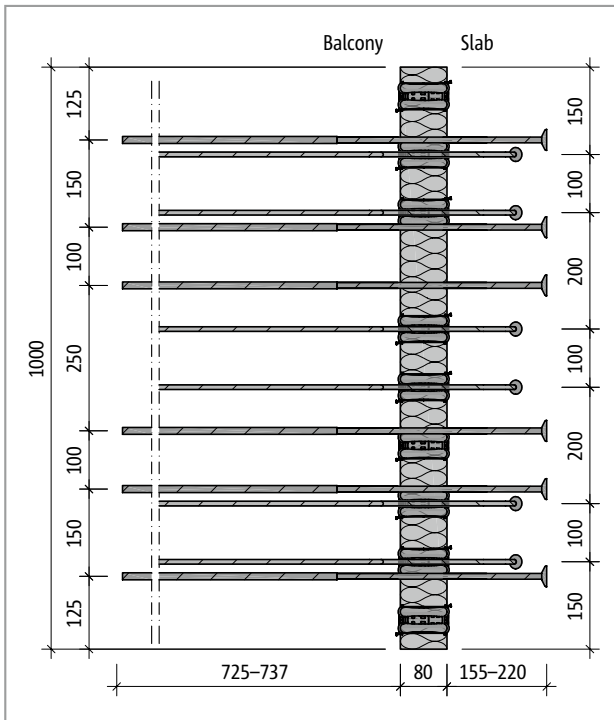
Schöck Isokorb® T type K-U-M2: Product layout
